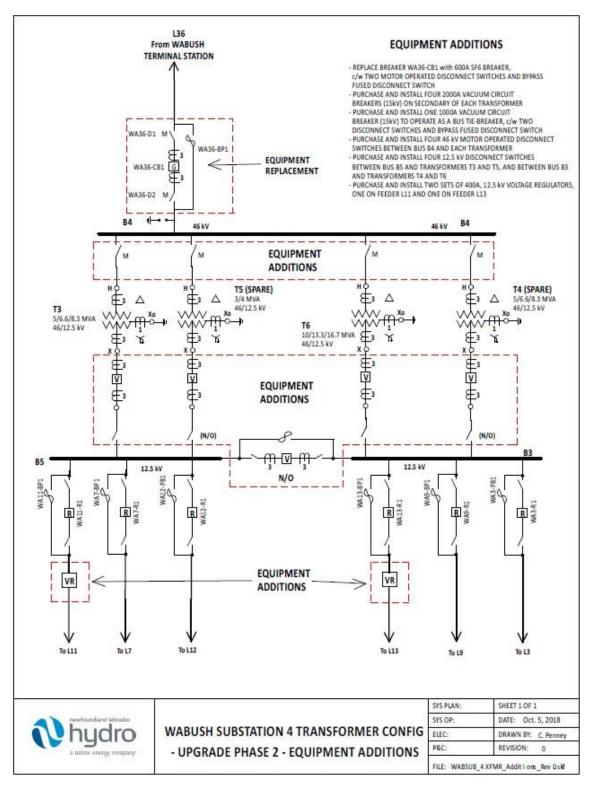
Wabush Substation 4 Transformer Configuration – Upgrade Phase 2 – Equipment Additions
